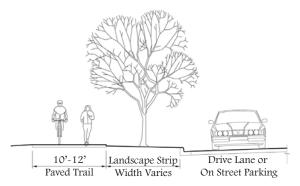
Roadside Greenway Trail/ Sidewalk
